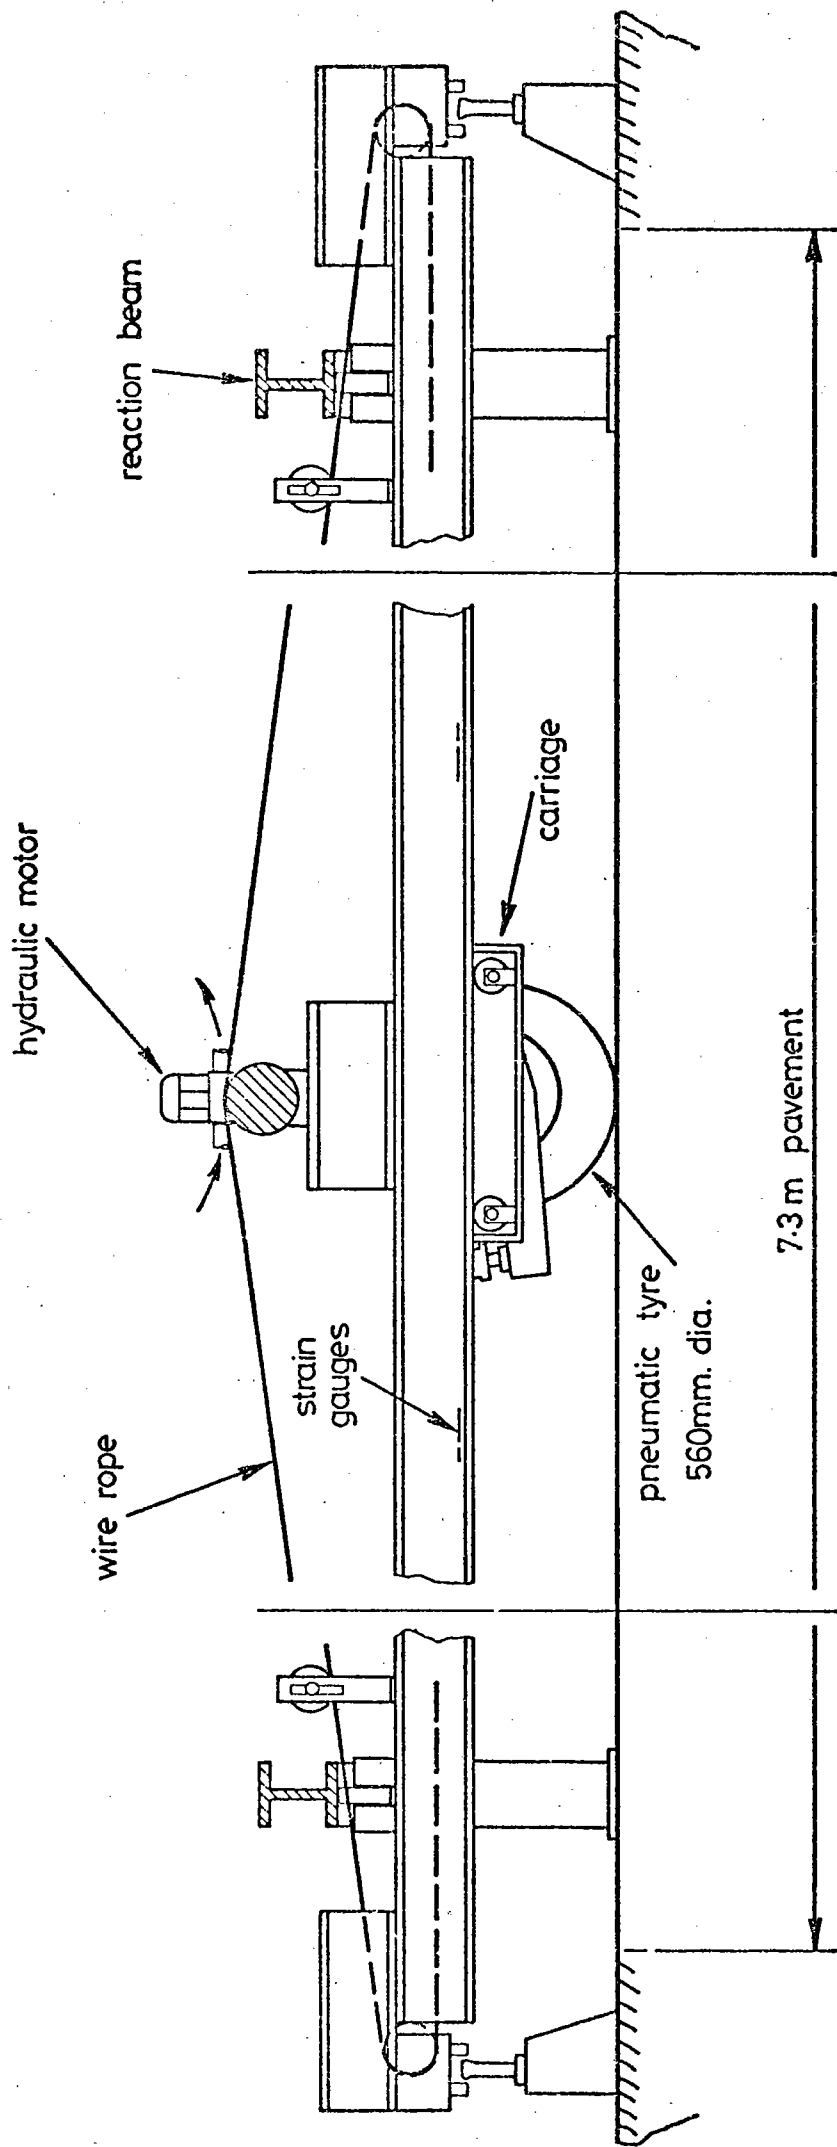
SCHEMATIC DIAGRAM OF TEST PAVEMENT
